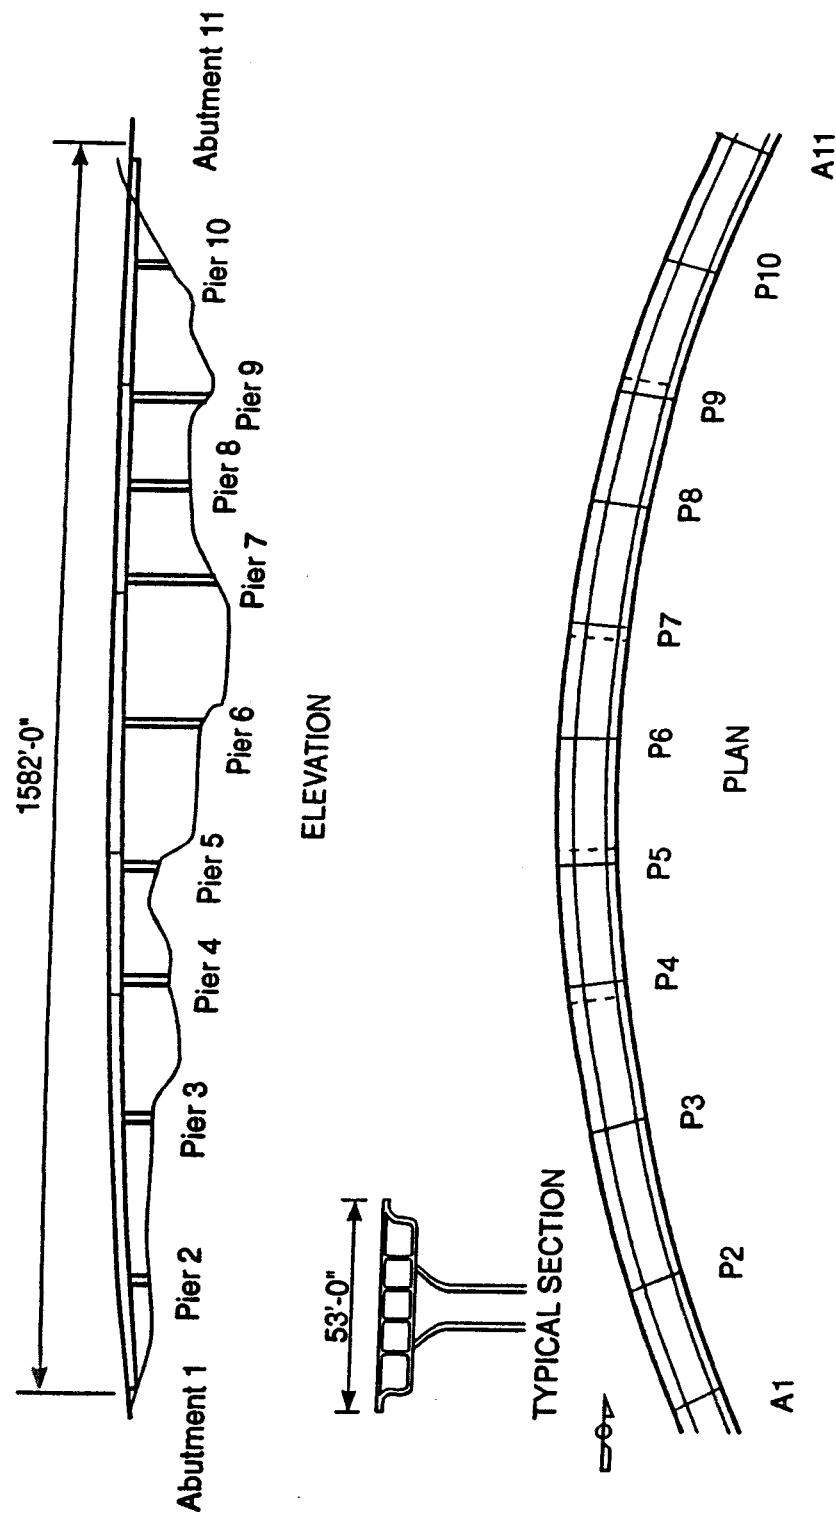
Elevation, Plan and Section Views of the Southbound SR14/I5 Separation and Overhead Taken from Buckle (1994).
